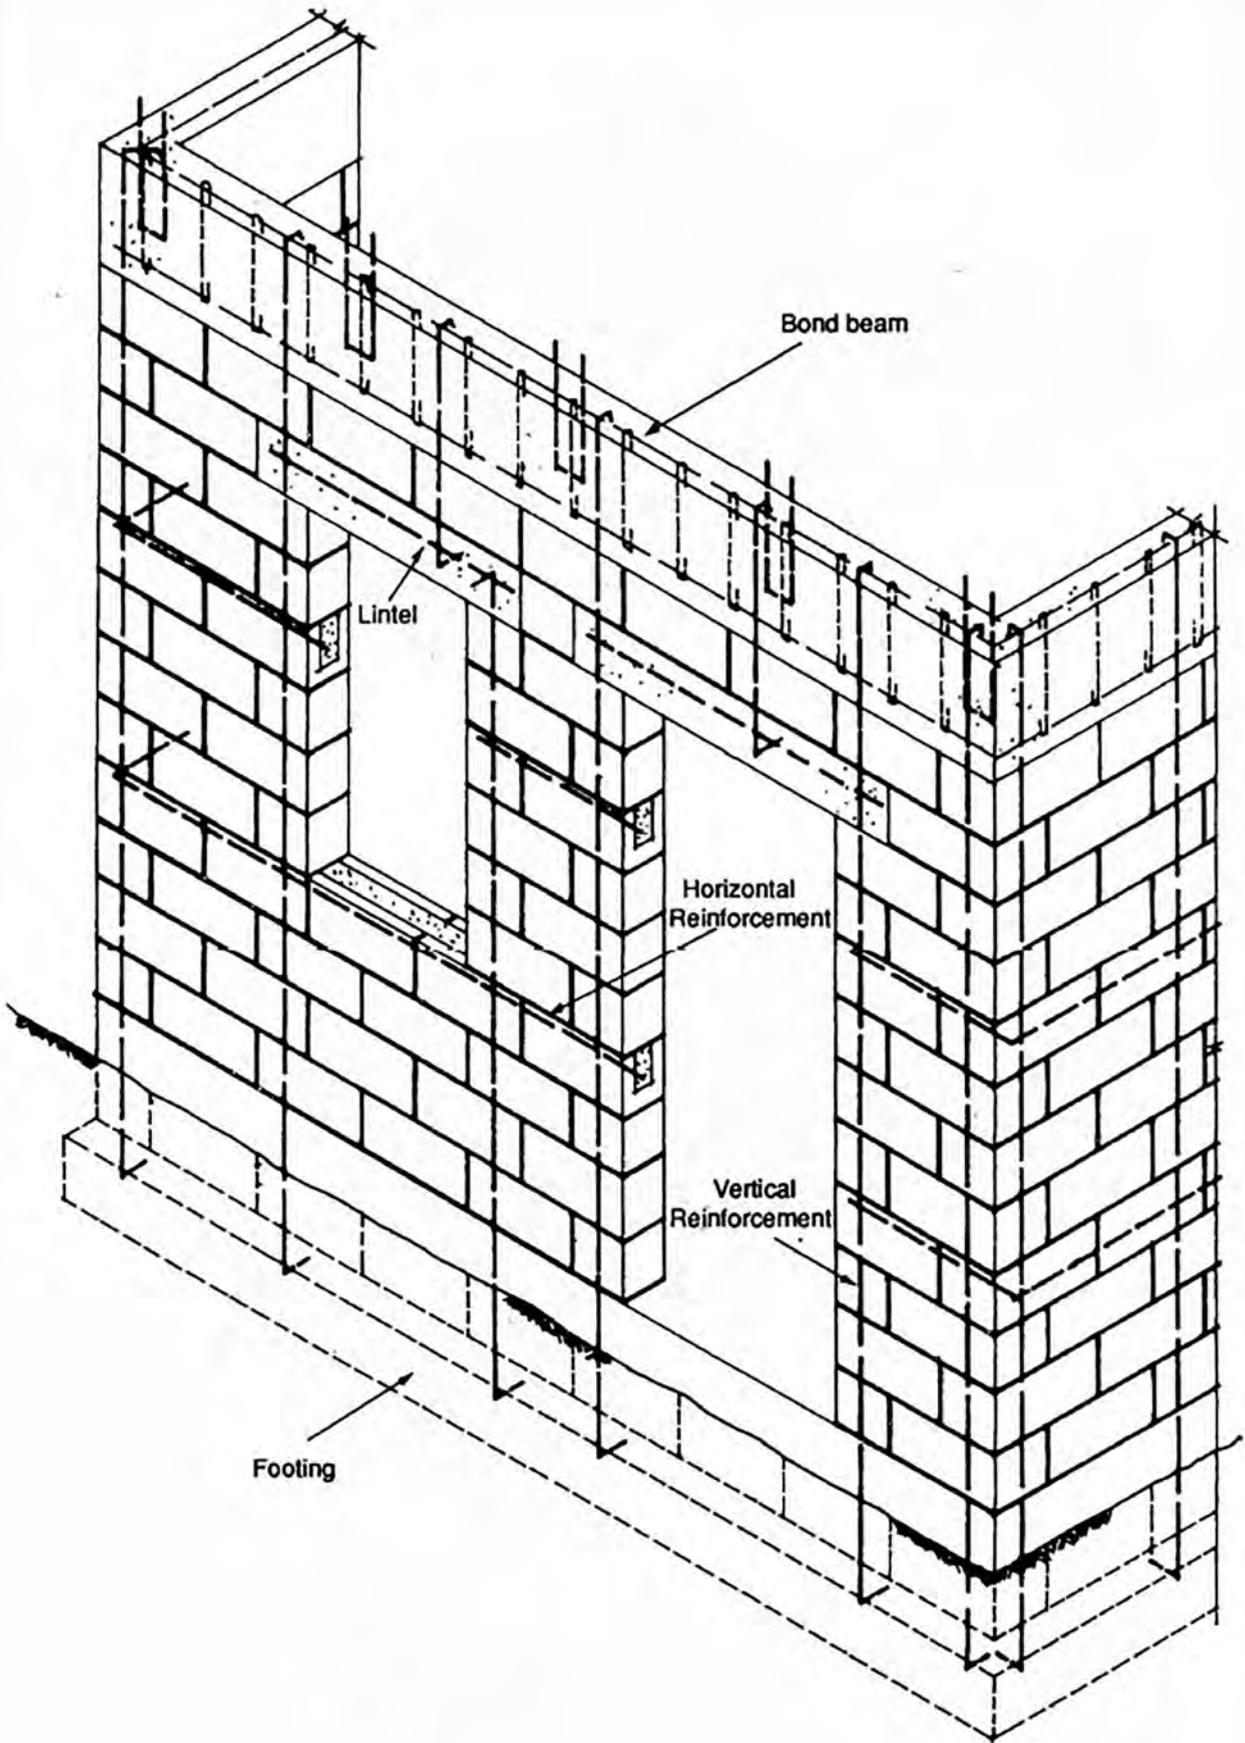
GENERAL CONSTRUCTION DETAILS FOR MASONRY HOUSES
